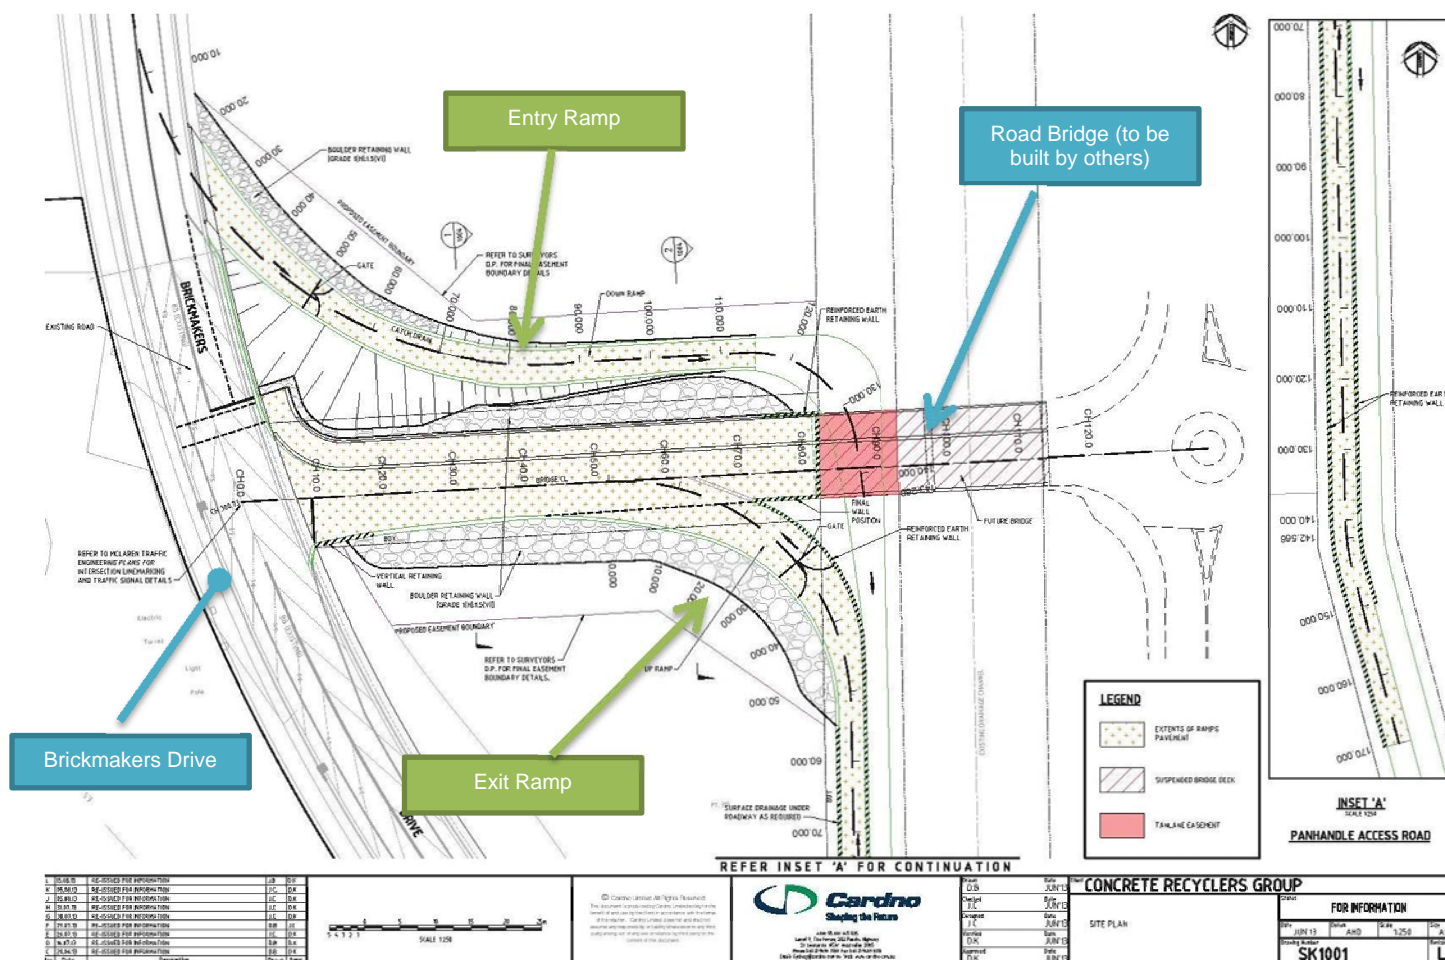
Proposed intersection with Brickmakers Drive and access within the ROW
